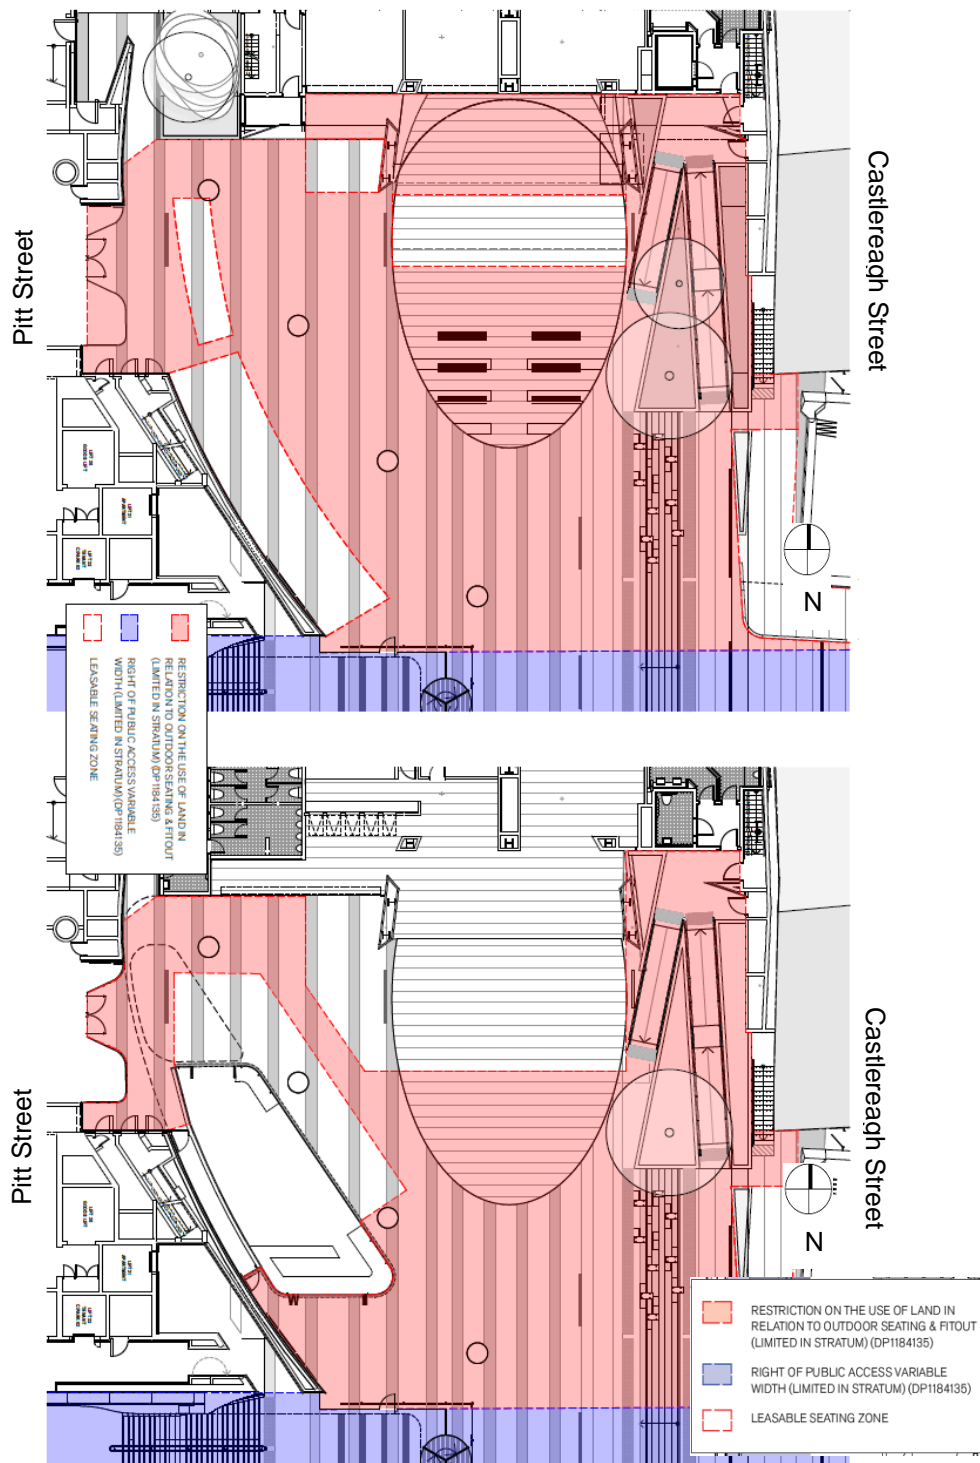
Approved and proposed Restriction on Land Uses Plan.
